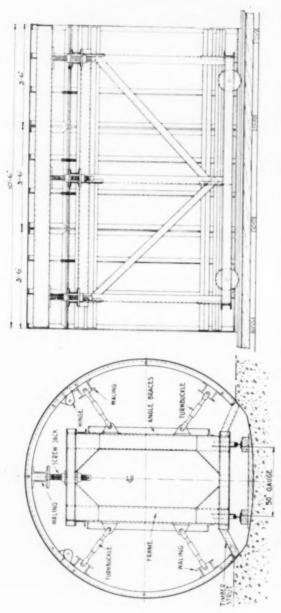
,-Cross Section and Longitudinal Section of Tunnel Shutter ready for Concreting.
